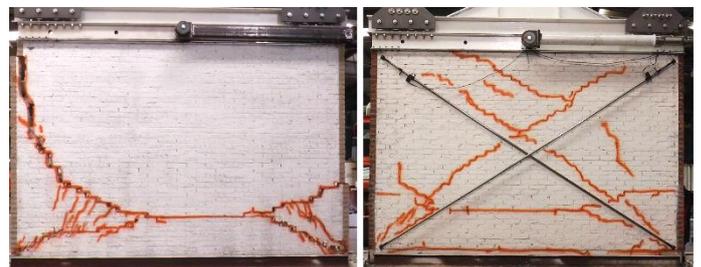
End state of both the reinforced/anchored masonry wall (right) and URM (left) without an opening.
